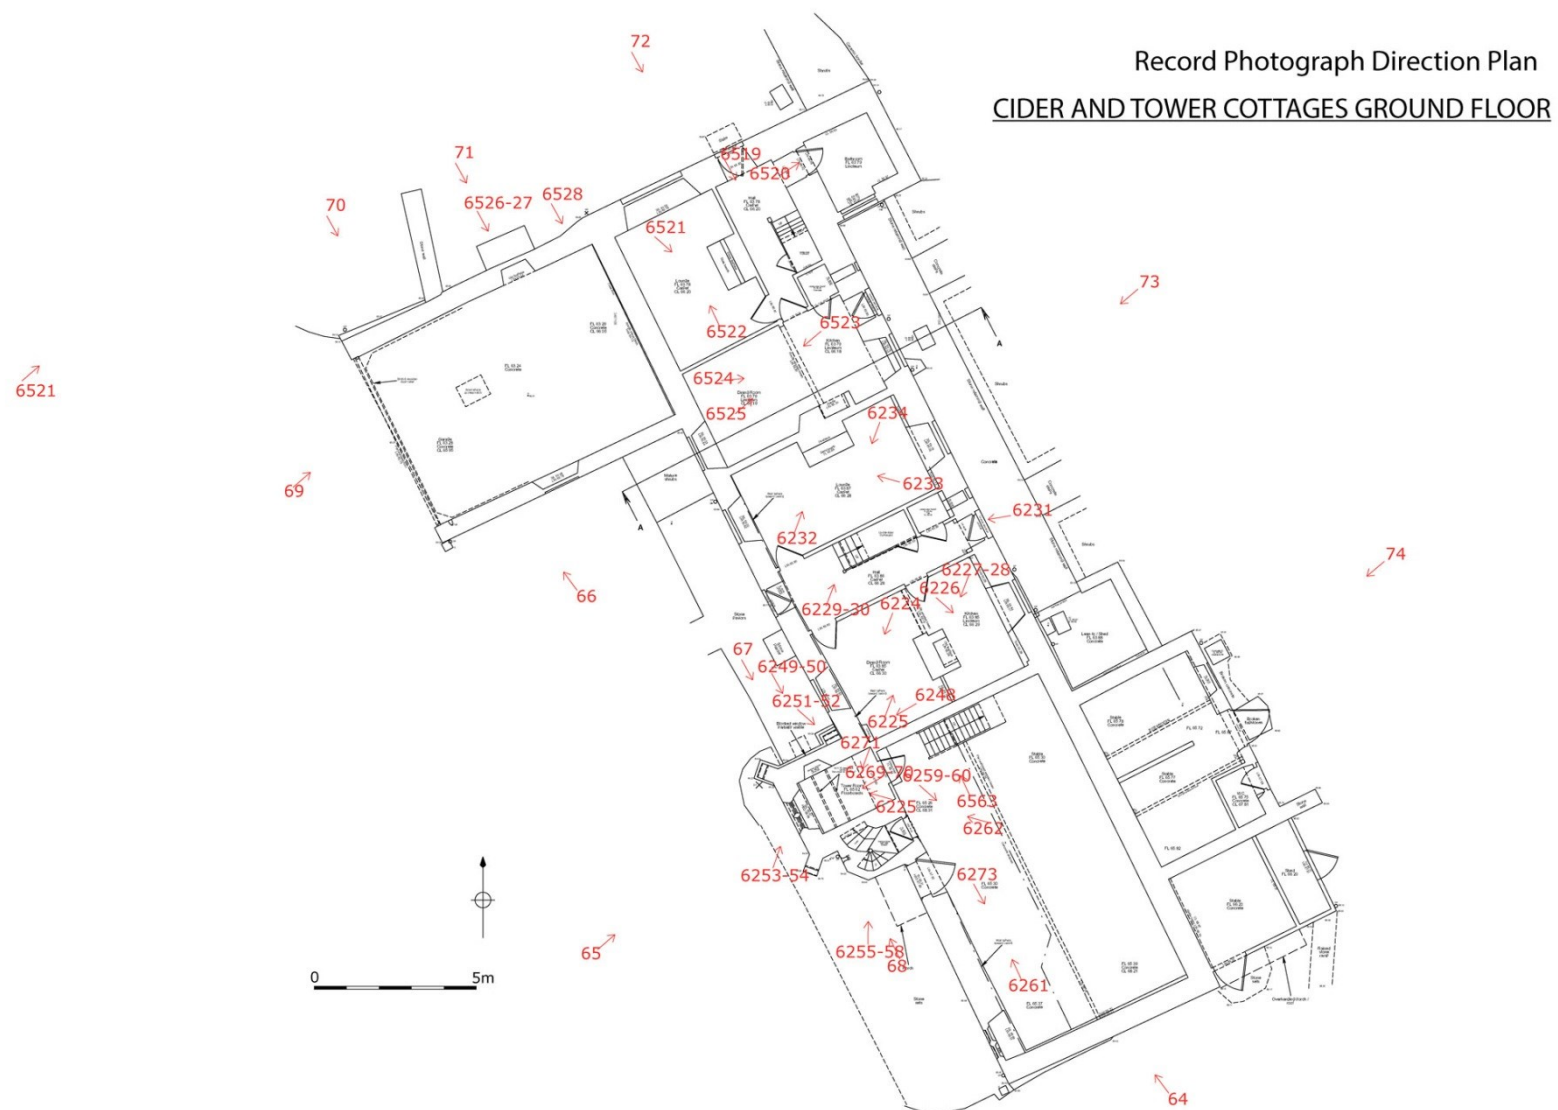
Photo direction plan – Cider and Tower Cottages: Ground Floor.
